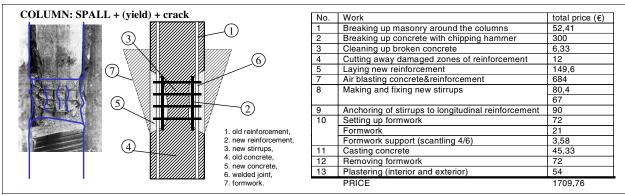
Damage image, reparation approach and device directory for repairing moderate column damage (after Bostenaru[4])
